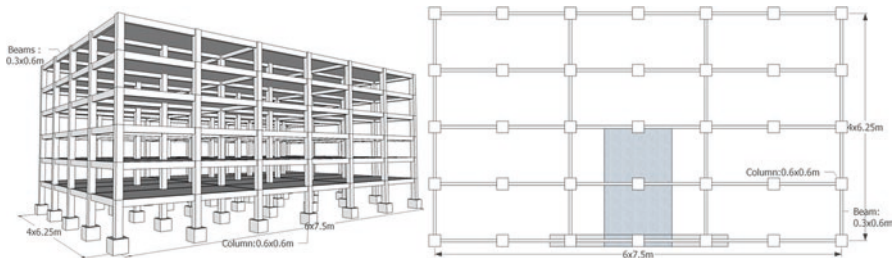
Schematic and framing plan of building analysed for earthquake and blast; slab and outer frame subassemblies tested and modelled under conditions simulating loss of a central outer column are highlighted
